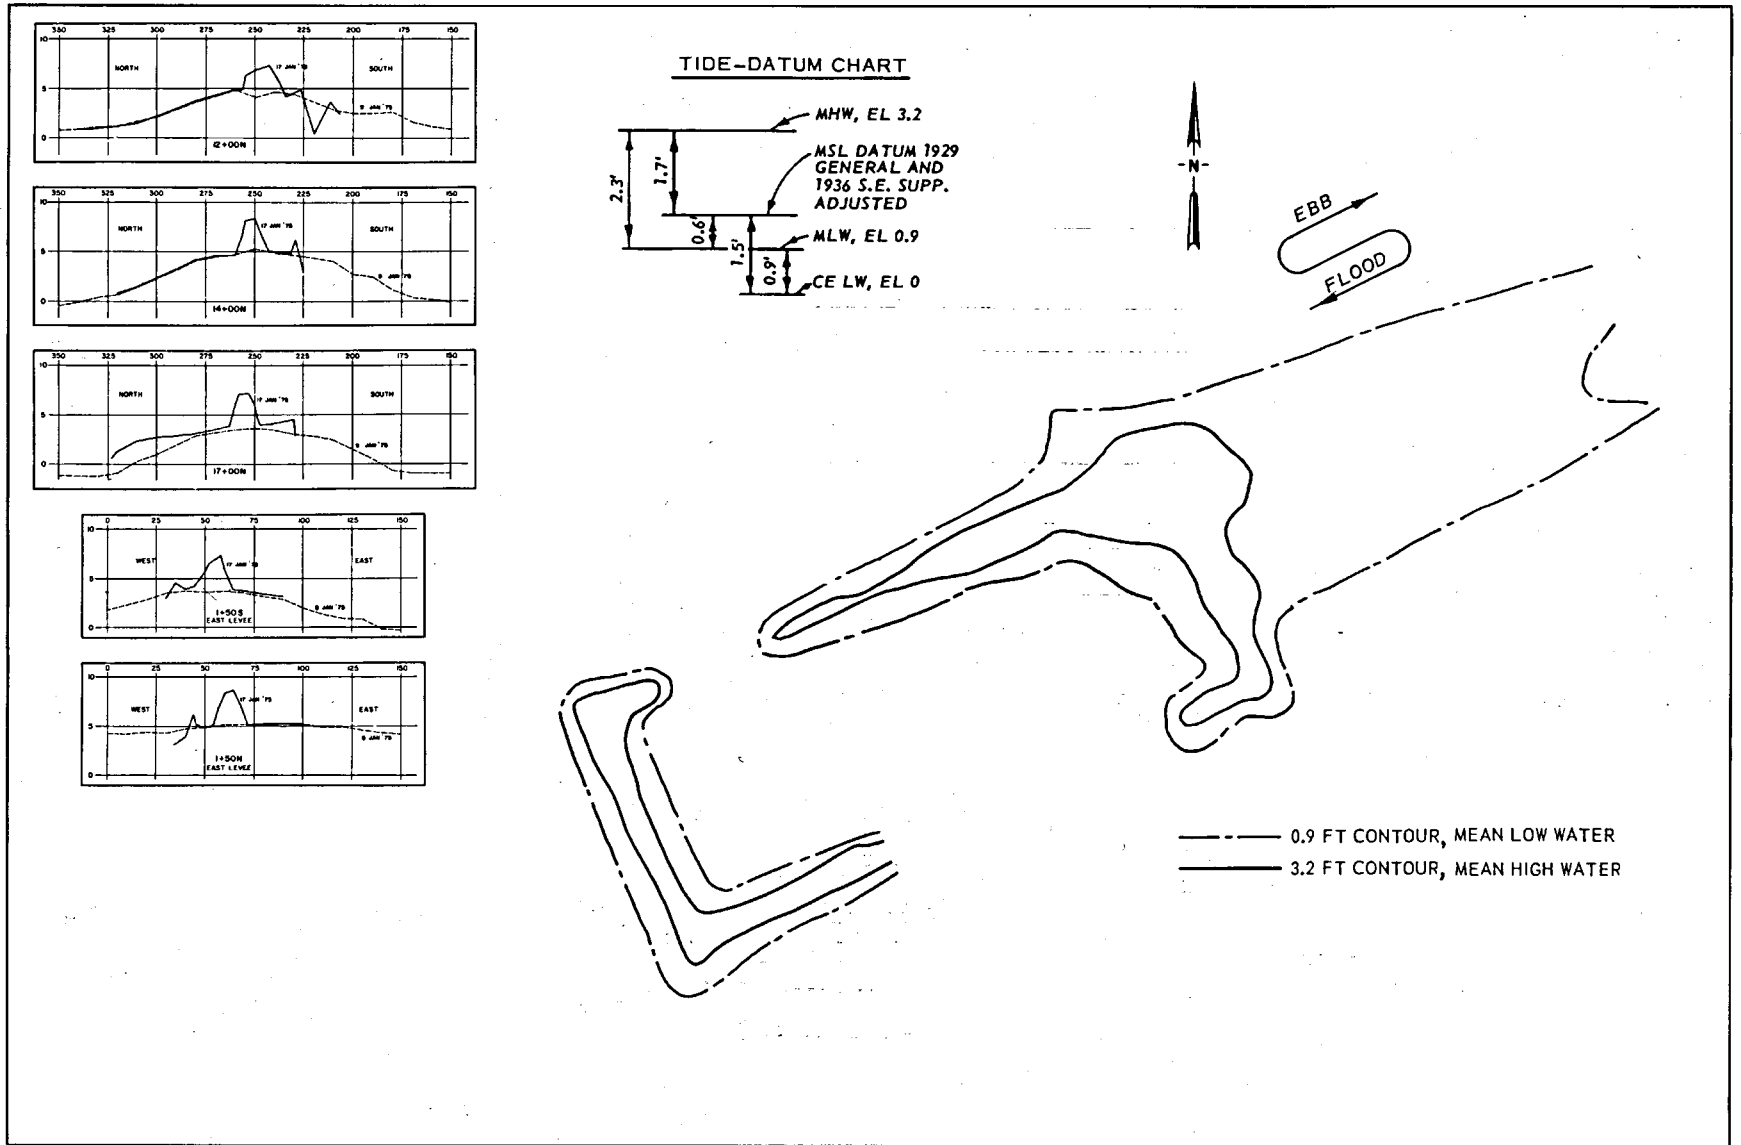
Elevation survey of the Windmill Point marsh development site during dike construction. Base map and elevation data provided by the Norfolk District, CE. (See overlay in envelope at back of report.)
